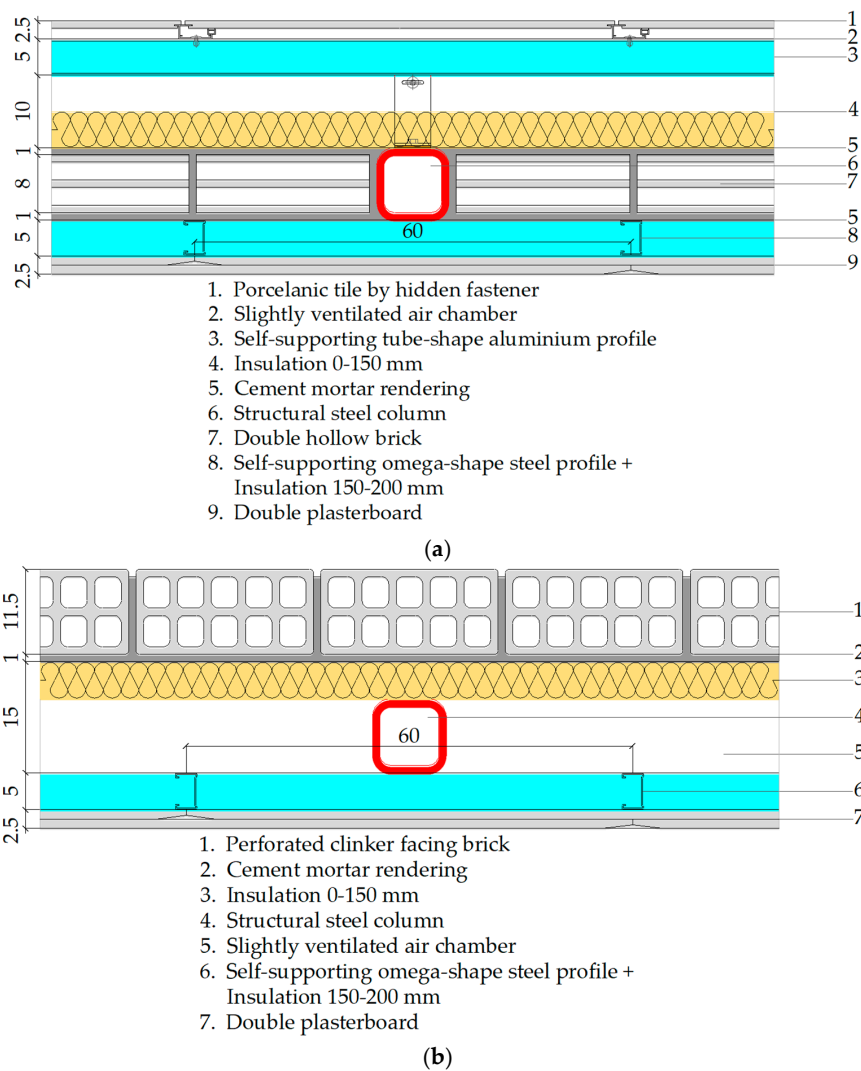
(a) Façade wall components detail for constructive solution 1. (b) Façade wall components detail for constructive solution 2.
